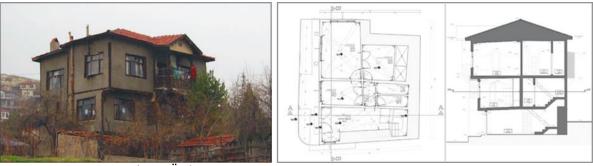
Mehmet Üsdün House (left) and Ground floor plan / A-A section (right)
